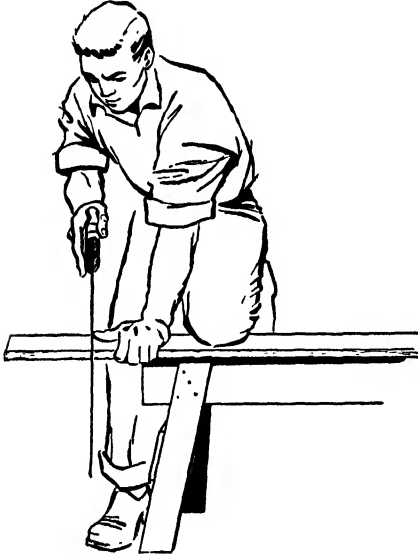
The saw, arm, elbow, shoulder, and right eye should all be in the same vertical plane.
